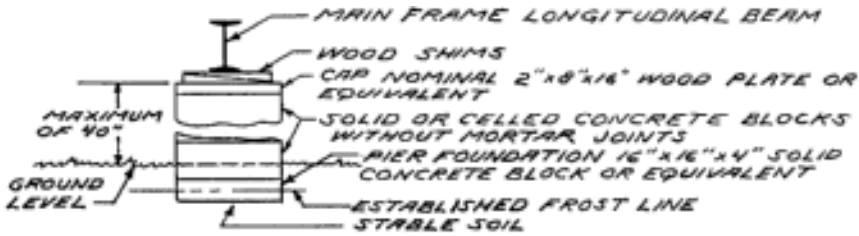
PIERS UP TO 40" IN HEIGHT (SINGLE BLOCK CONSTRUCTION)
